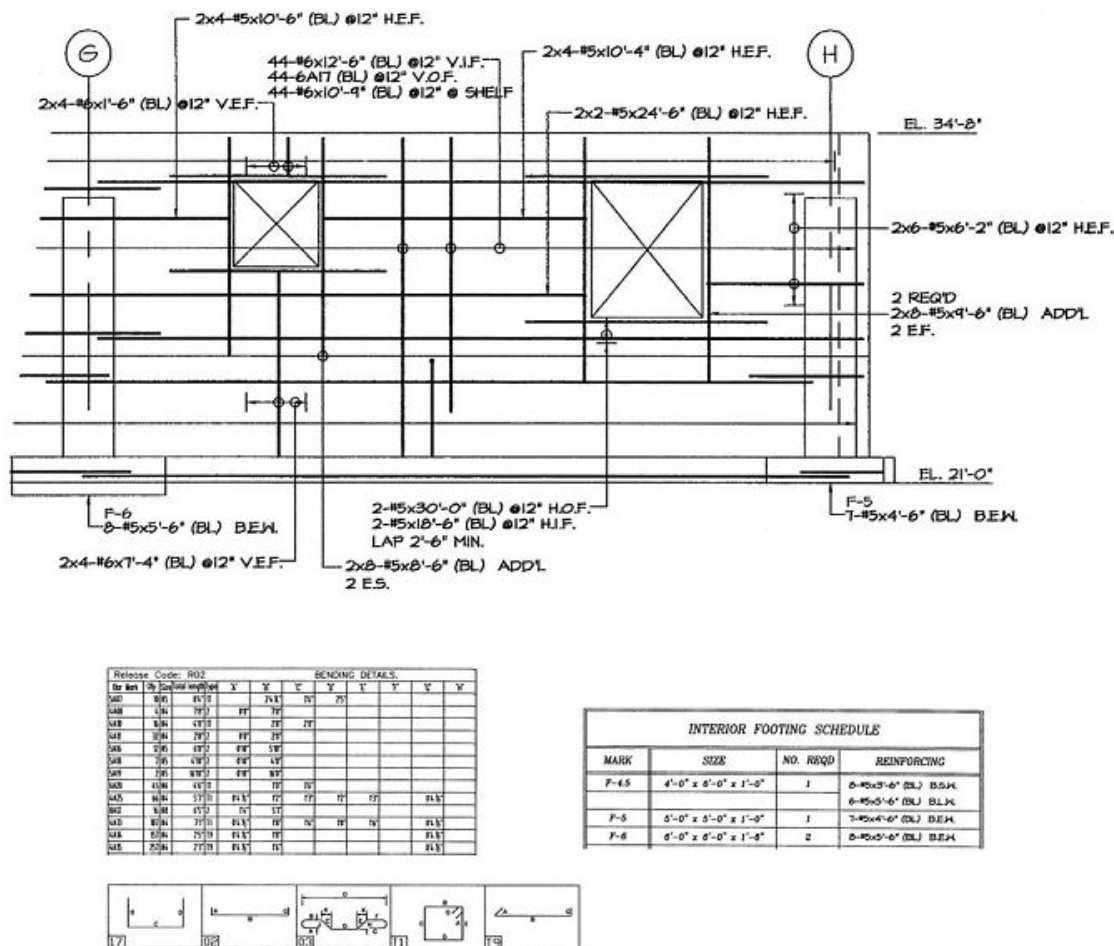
A shop drawing shows how steel reinforcements will be used in a foundation wall. (Source: Stephen Shay/Creative Commons (CC BY-SA 3.0)/https://commons.wikimedia.org/wiki/File:Example\_of\_Steel\_Reinforcement\_Shop\_Drawing.jpg)
